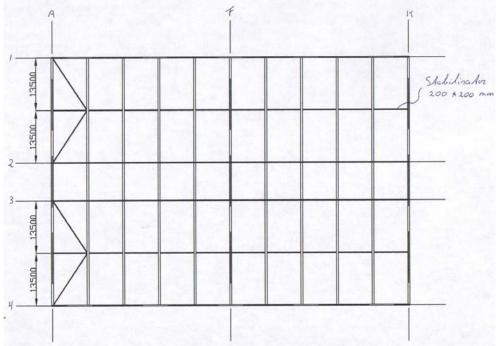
Top view cross-section of bottom floor with buckling stabilisation.
